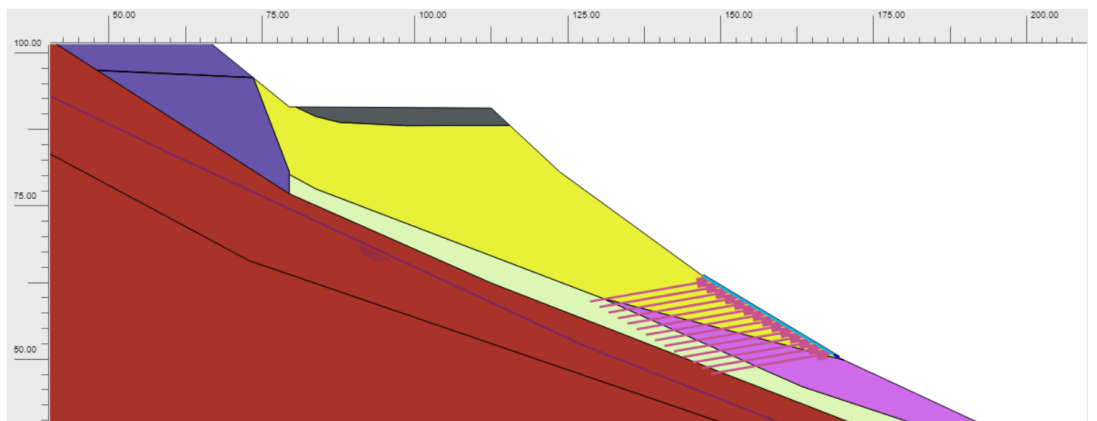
Soil Nail layout with 1.8m spacing and 10 degree inclination
